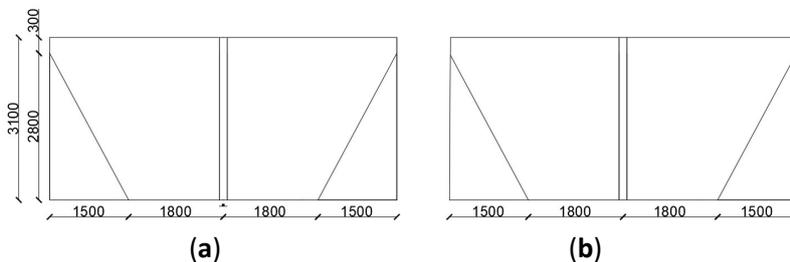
Variant 1 Box profiles: (a) Front façade, (b) Back façade.
